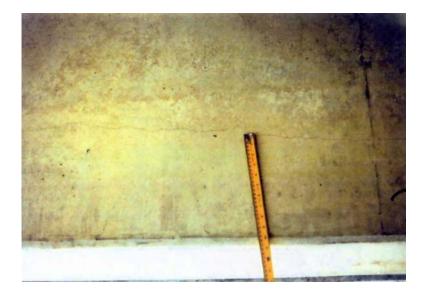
Type FM Girder – Typical longitudinal crack on inside web at abutment
